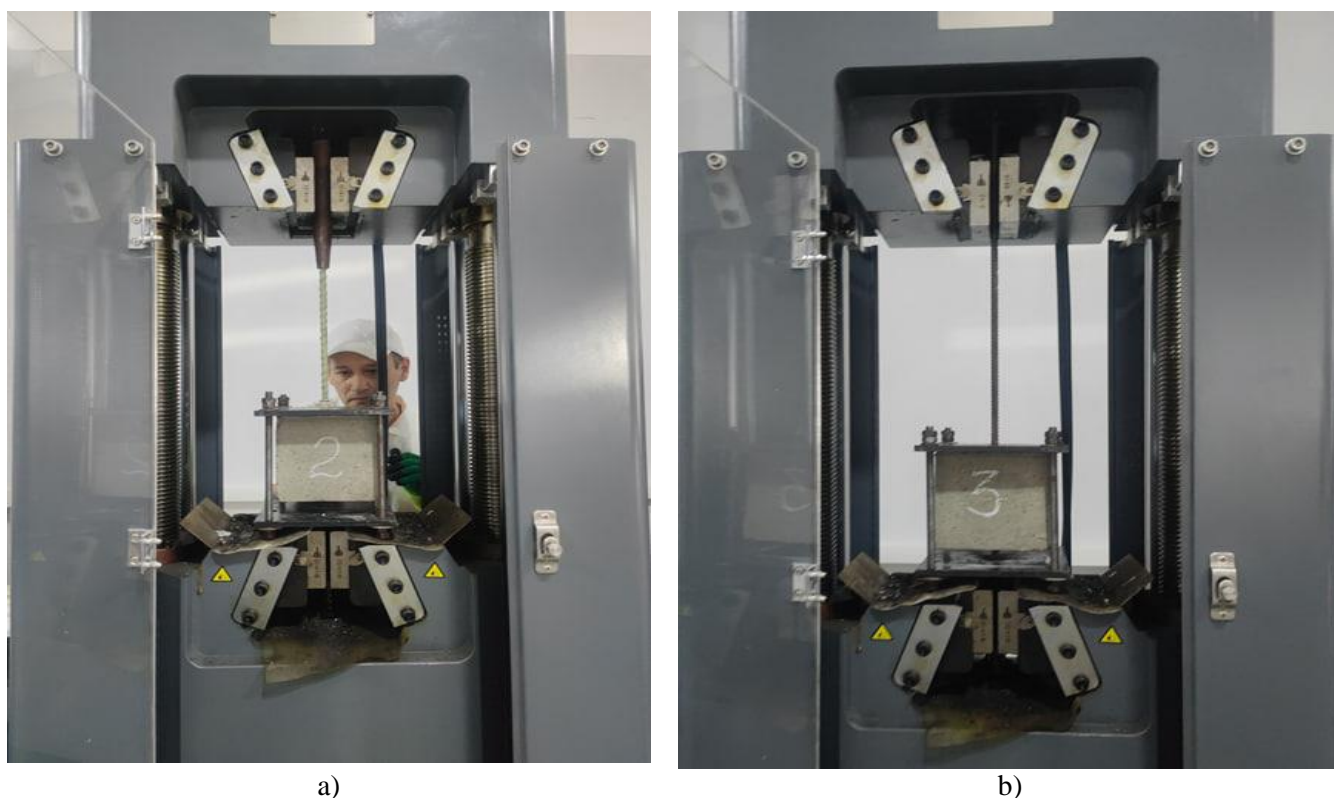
Test for determining the bond strength between concrete and GFRP (a) and steel (b) reinforcement
